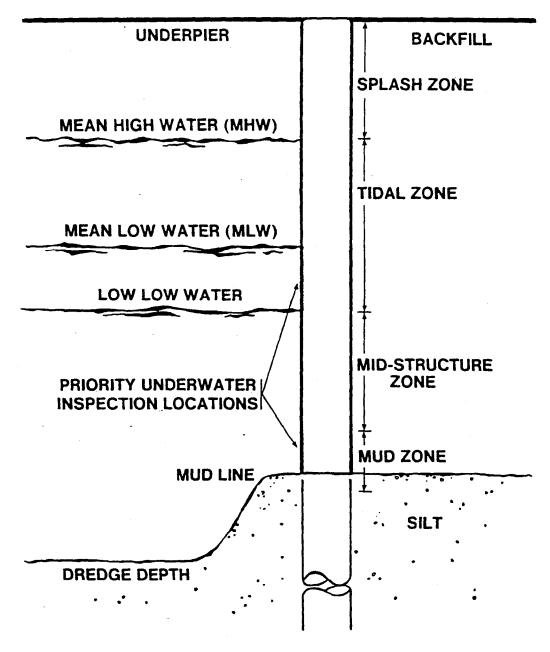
Pier/Wharf - Bulkhead/Quaywall Terminology
